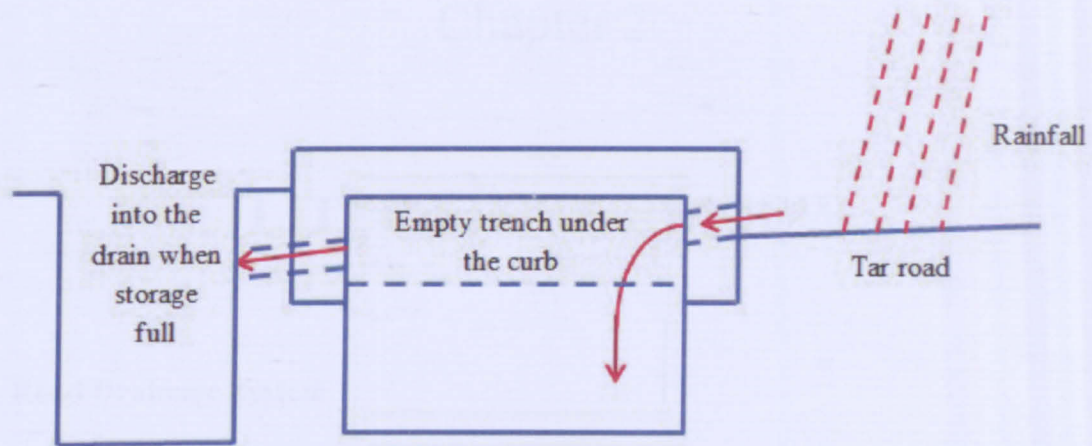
Hollow Infiltration Trench merged with Road Curb (Ng, 2016).
